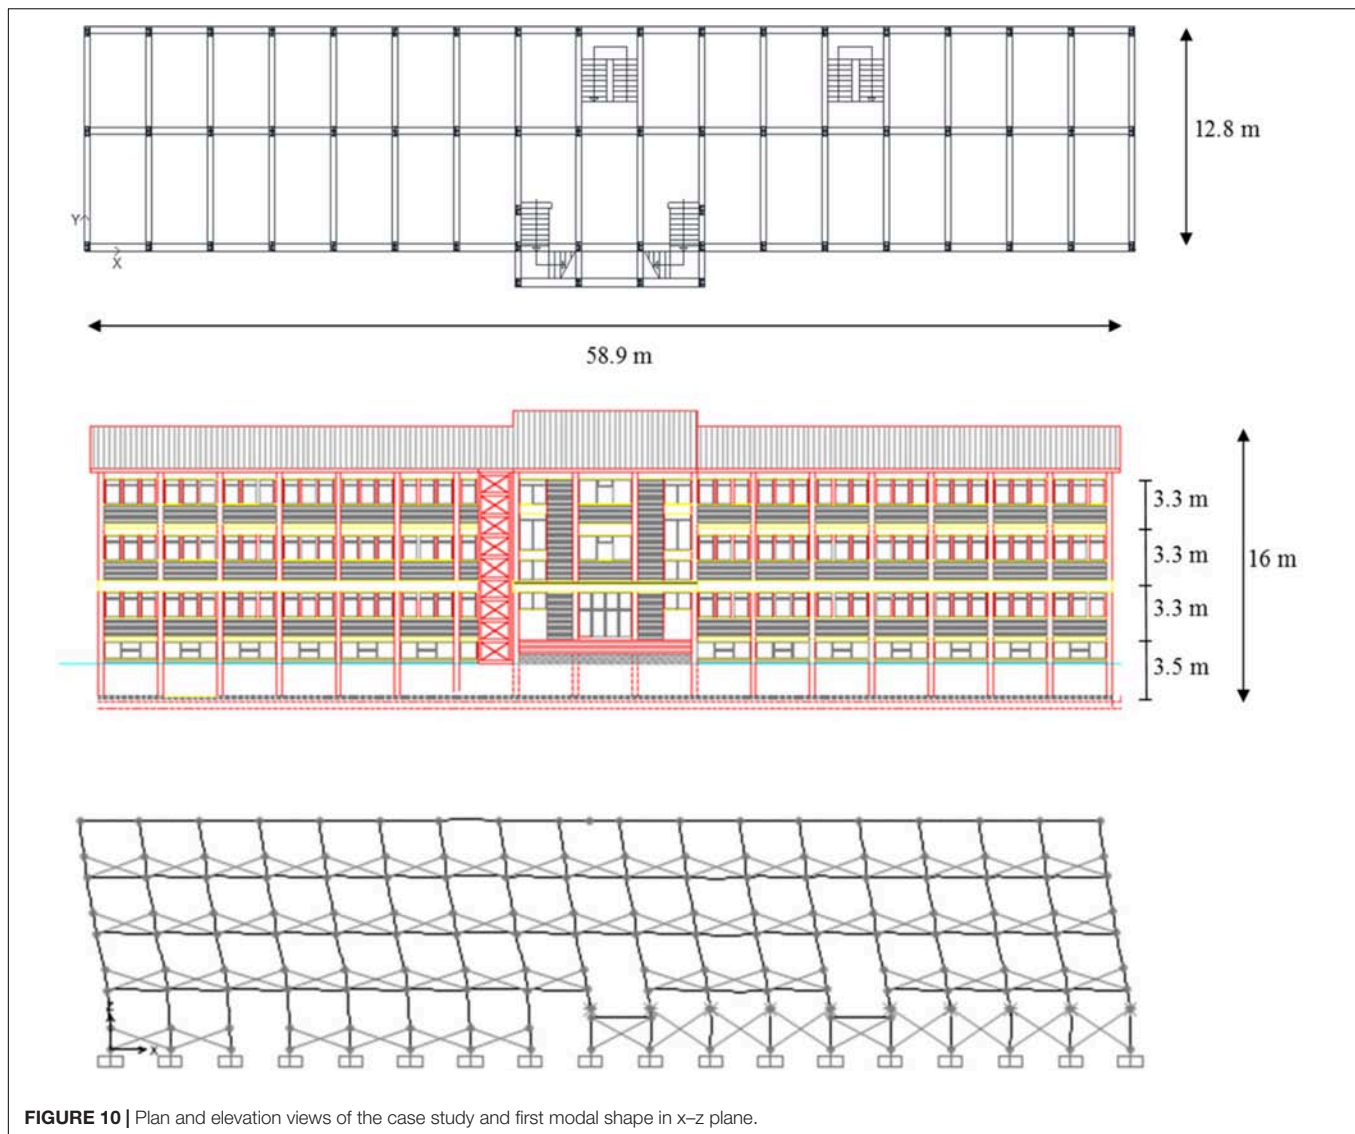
| Plan and elevation views of the case study and first modal shape in x-z plane.
